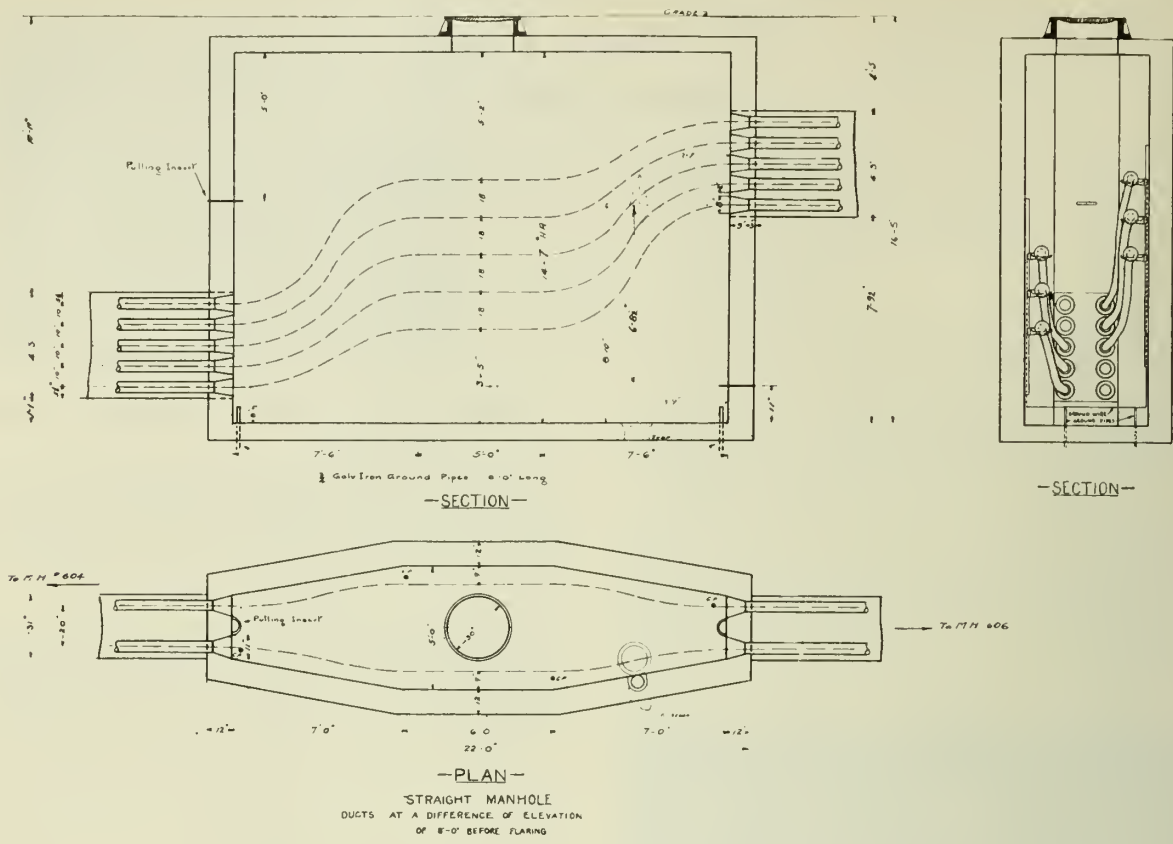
Plan and Elevation of 66-kv. Manhole.
